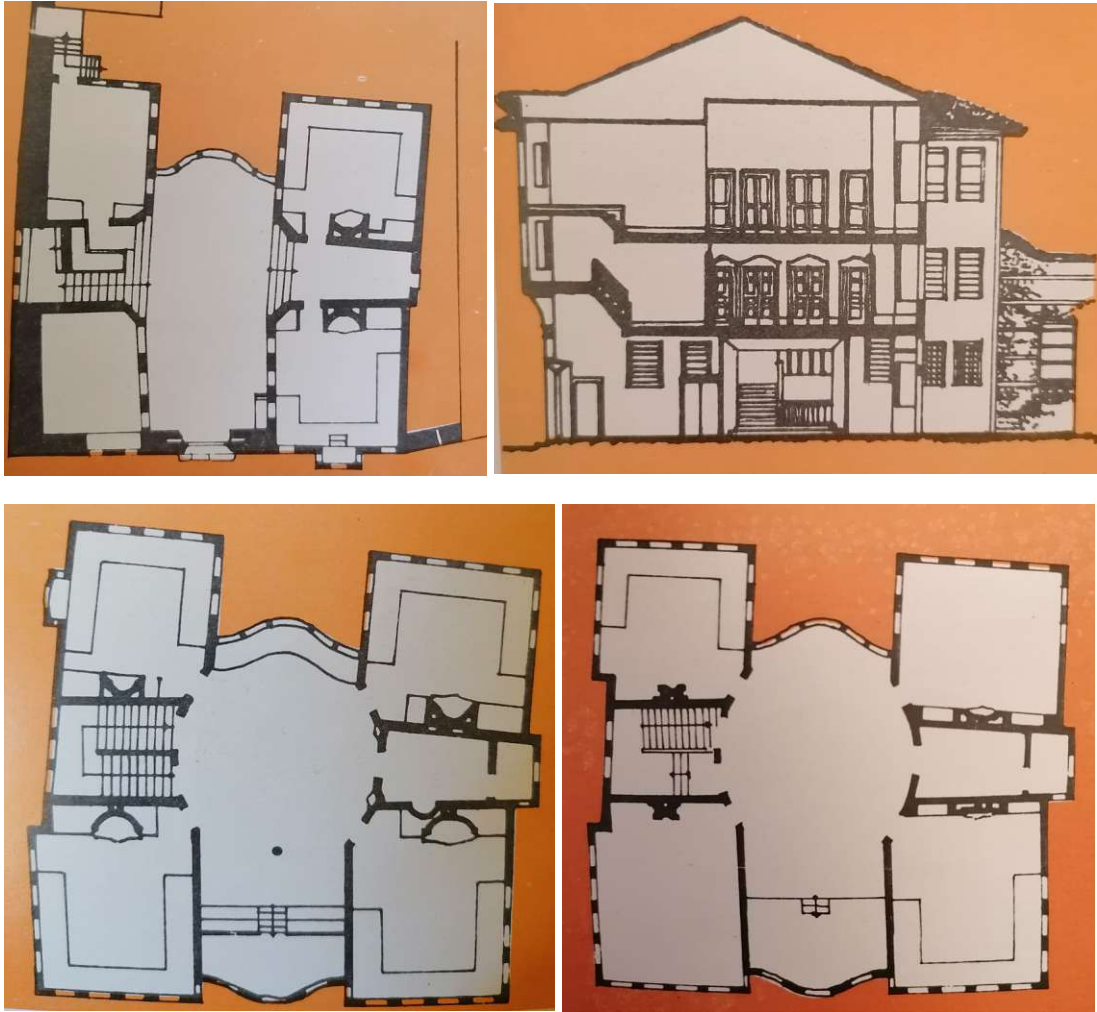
Dimitar Georgiadi house plans - Ground floor (up left), Section (up right), First floor (down left), Second floor (down right) (Balabanova, 1978)
